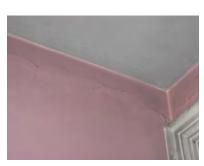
Hairline cracks on walls close to ceiling. (Photo: BBB, 2007)
